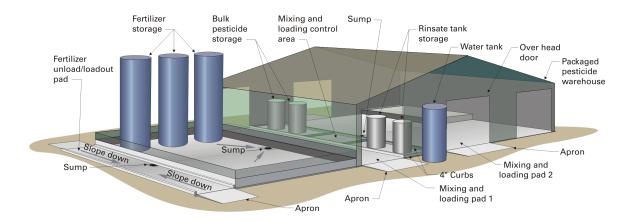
Large-scale facility, perspective view. Optional roof over entire facility except fertilizer secondary containment and bulk unload pad.
